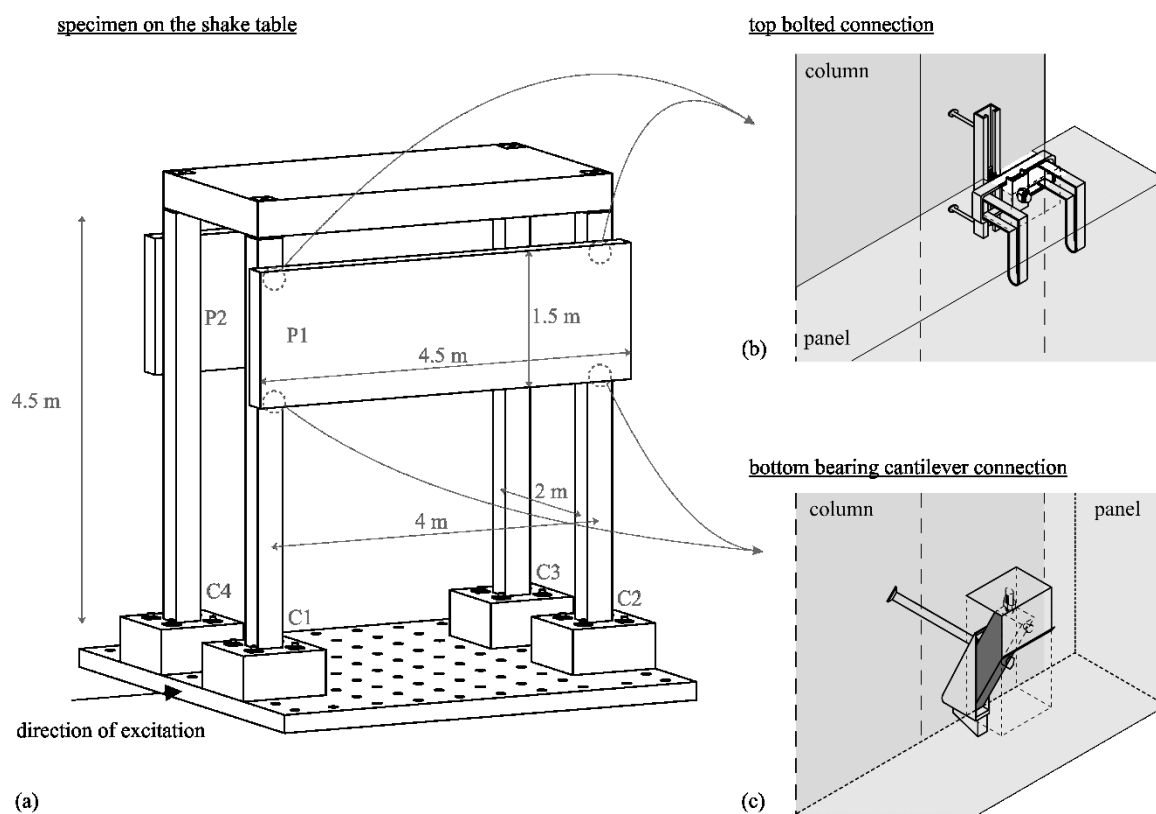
Tested specimen: (a) geometry in 3D view, (b) top cladding connection and (c) bottom cladding connection
